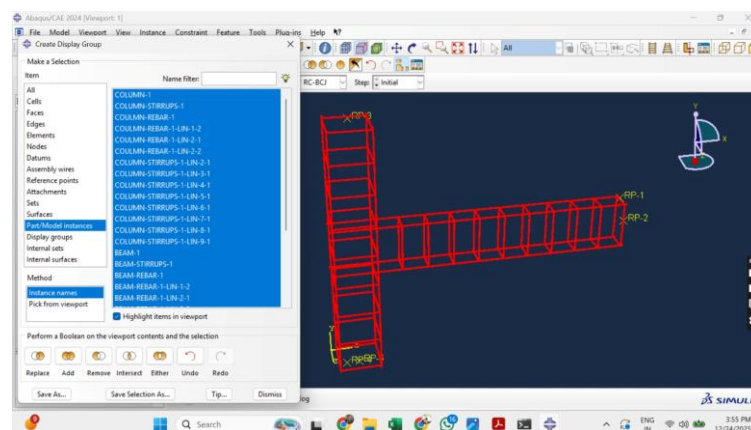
Rebar cage model (T3D2 truss elements) — longitudinal bars and stirrups, highlighted in Abaqus/CAE 2024 Display Group module.
